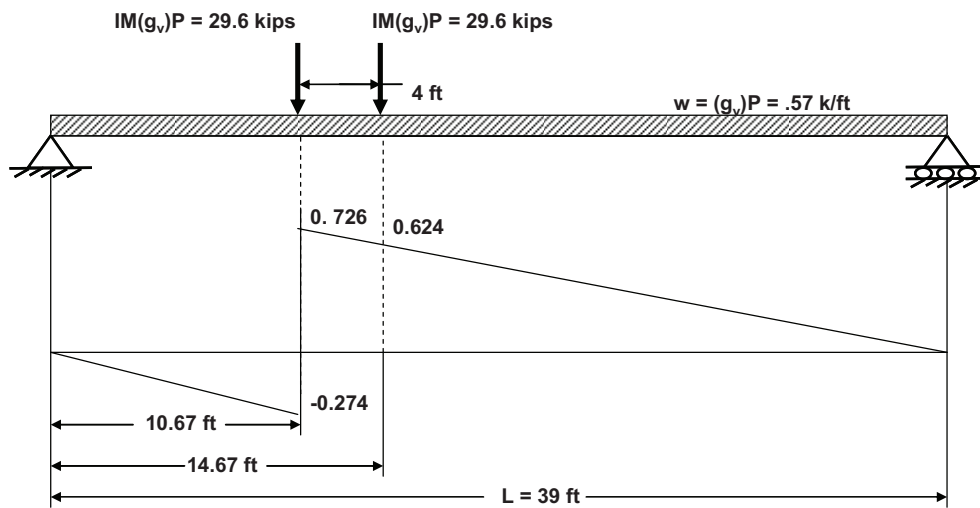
Interior Beam Shear Design Tandem at 10.67 ft from support
